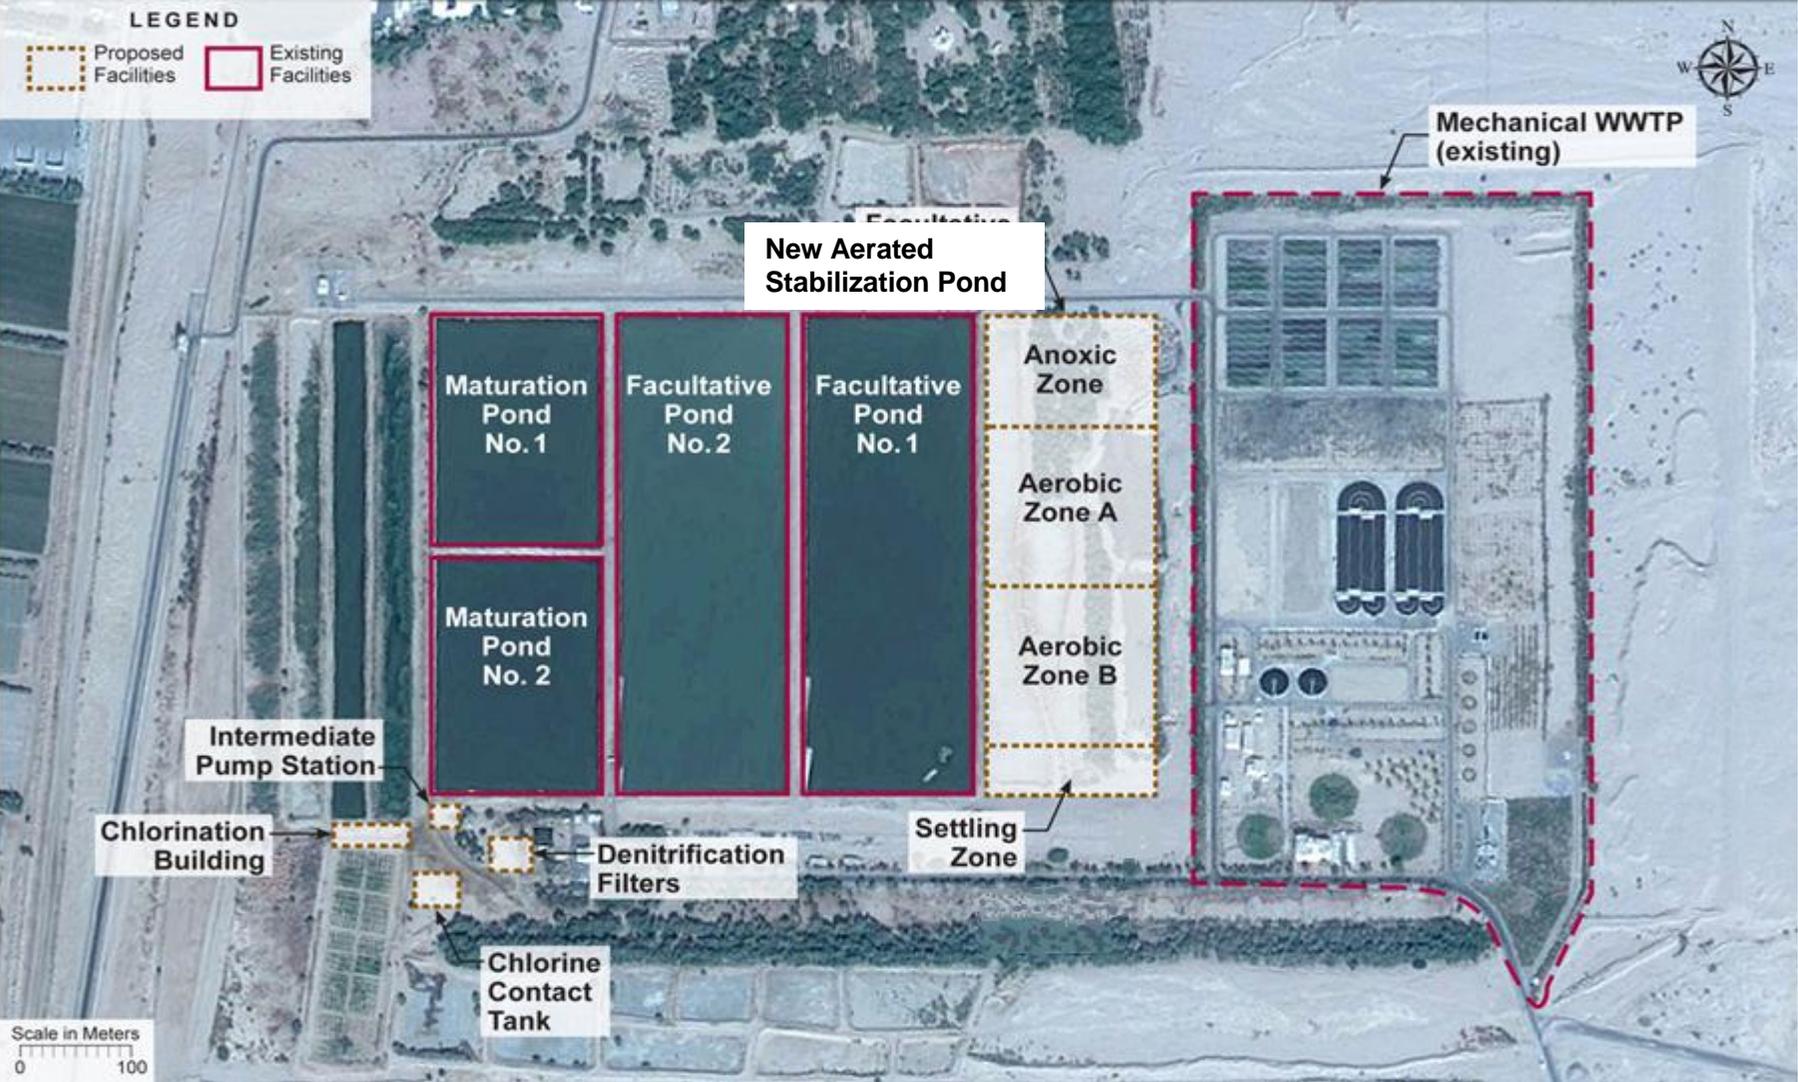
Natural WWTP Option 2 Proposed Layout of New Aerated Stabilization Basin
